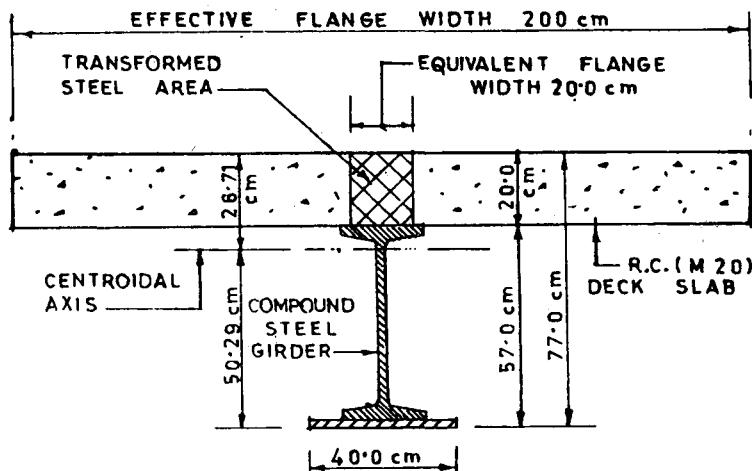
COMPOSITE SECTION((STEEL &amp; CONCRETE)(Ex.15.1))
